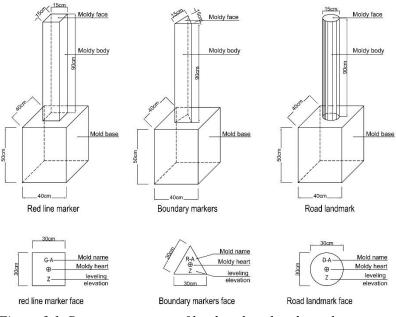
Propose structure of landmarks related to urban ground elevation.
